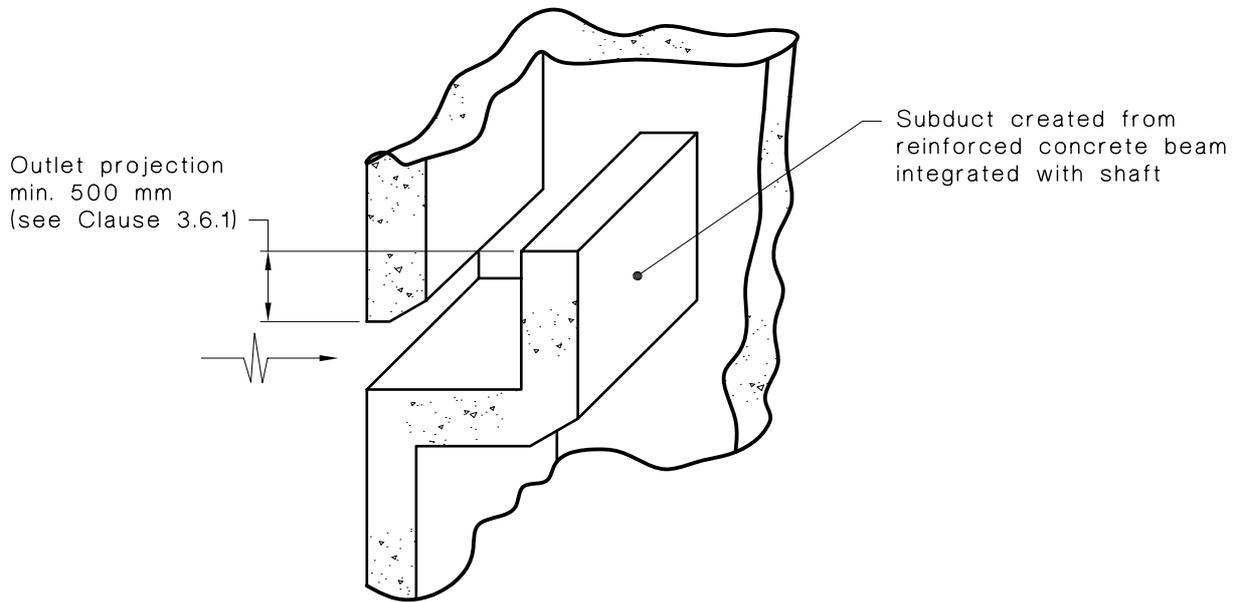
TYPICAL 'ALTERNATIVE MATERIAL' SUBDUCT USING REINFORCED CONCRETE
